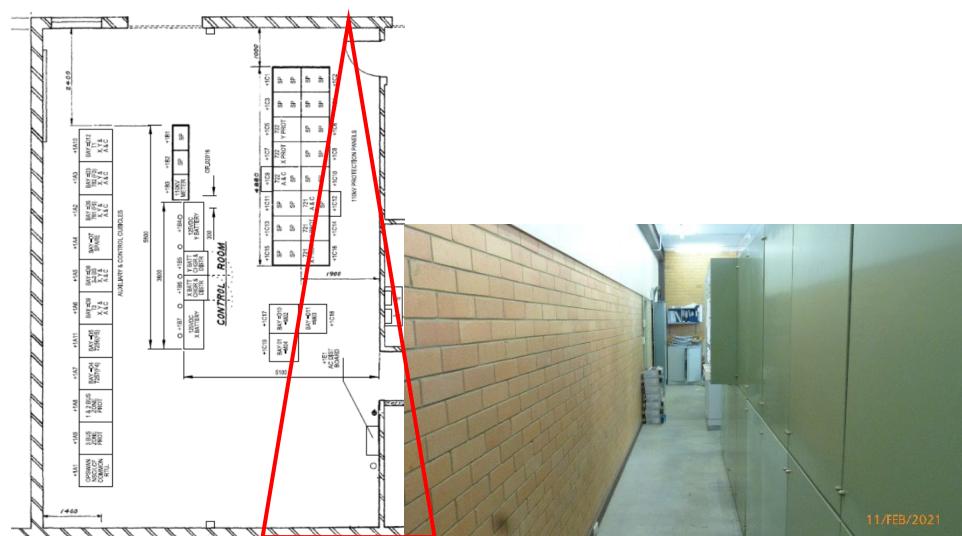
Substation Secondary Systems Building +1 Internal View 2.
